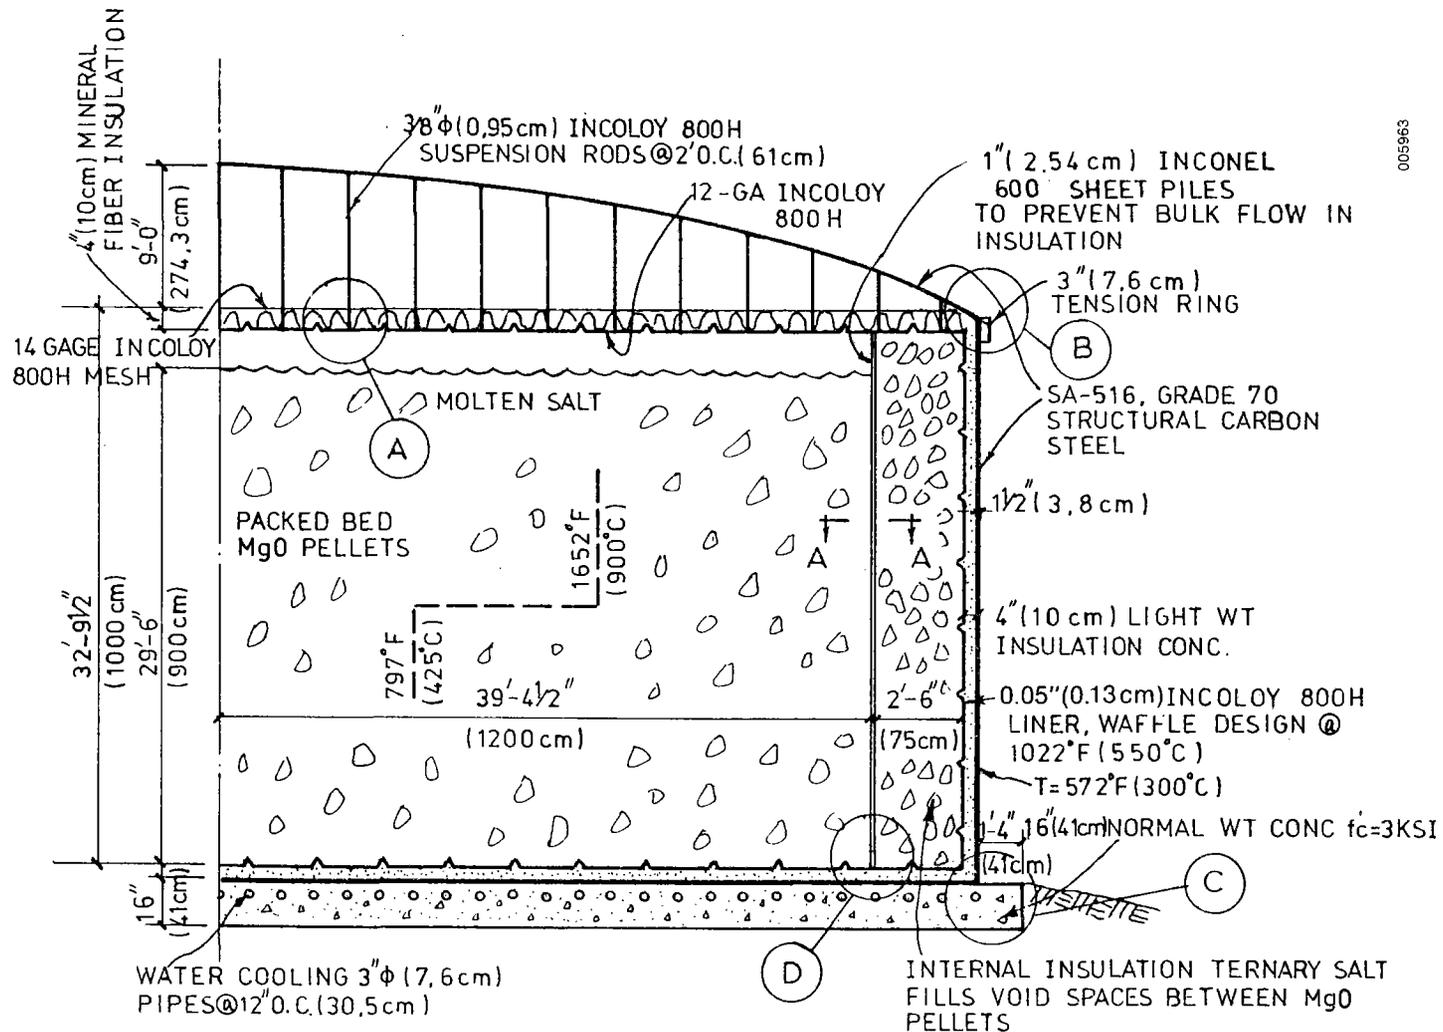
Details of Single-Tank, Two-Media Cylindrical Tank (Steel Tank).
